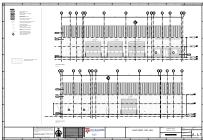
21 A-4.1-BUILDING ELEVATIONS
